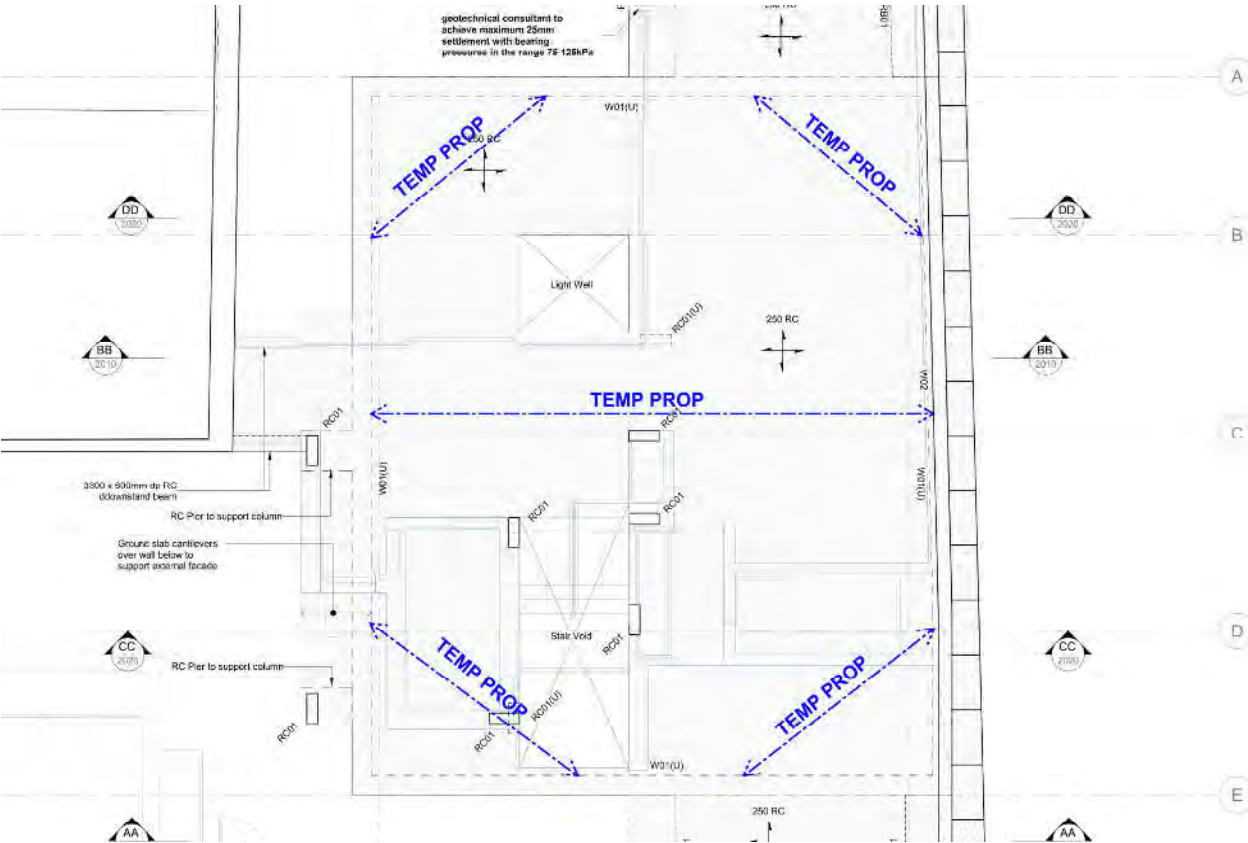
Plan at Ground floor indicating possible flying shores at close centres to restrain surrounding earth until slab is poured
